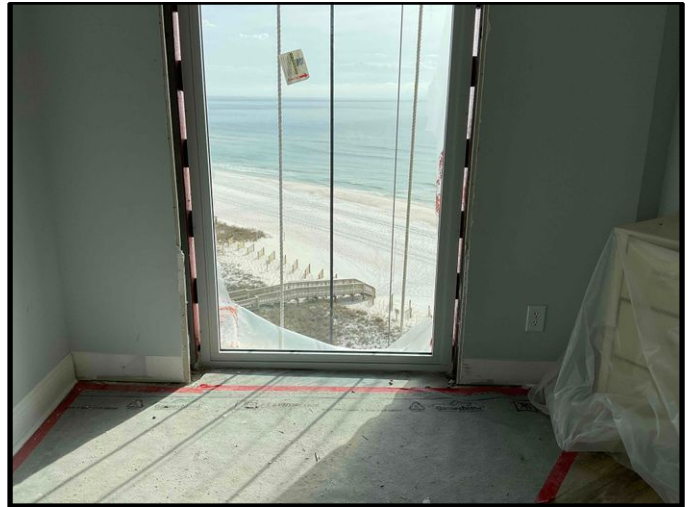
East Elevation - Bedroom Window - Unit No. 800 - View of window replacement - Work in Progress.
